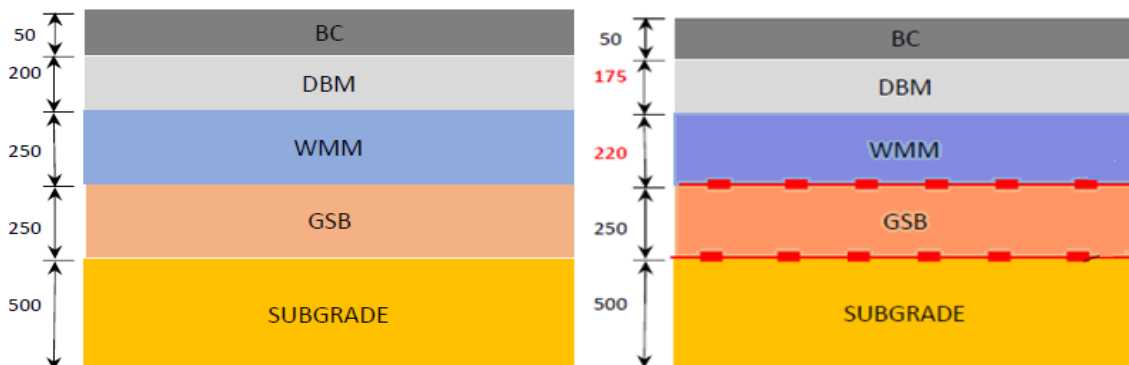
Non-Stabilised Cross-Section of Pavement as Per IRC 37:2018 vs. Cross-Section of Pavement Stabilised and Optimised With Tensar Triax Tx 160
